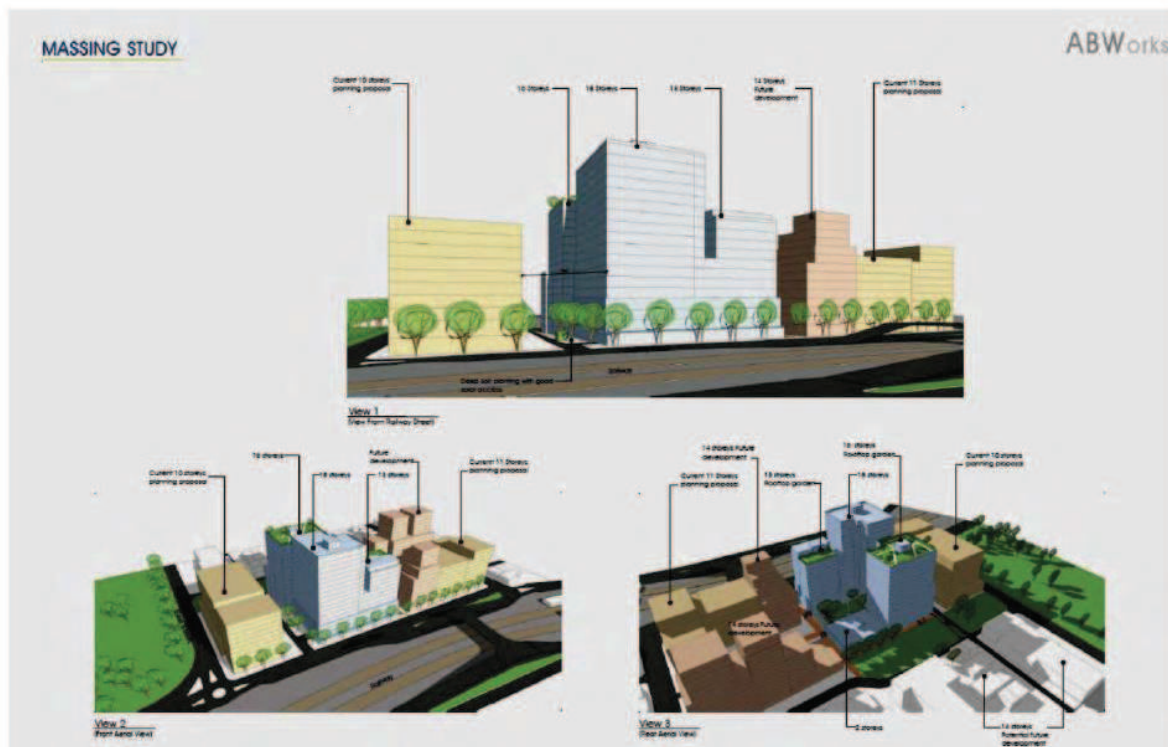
Indicative Planning Proposal Request concept - street and oblique views
